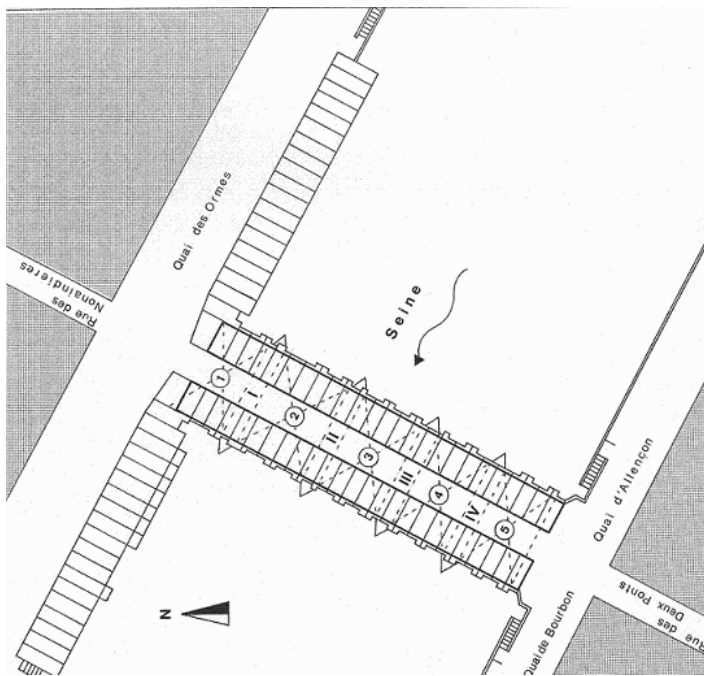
Pont Marie, Arch and Pier Numbers, Reconstruction M. Mislin
